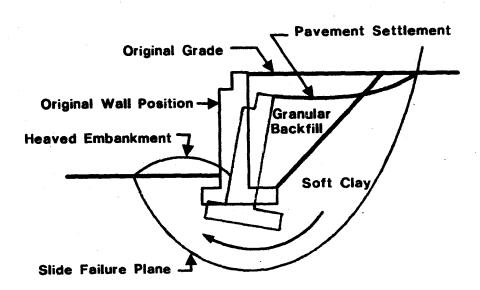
Lateral Movement of an Abutment Due to Slope Failure
